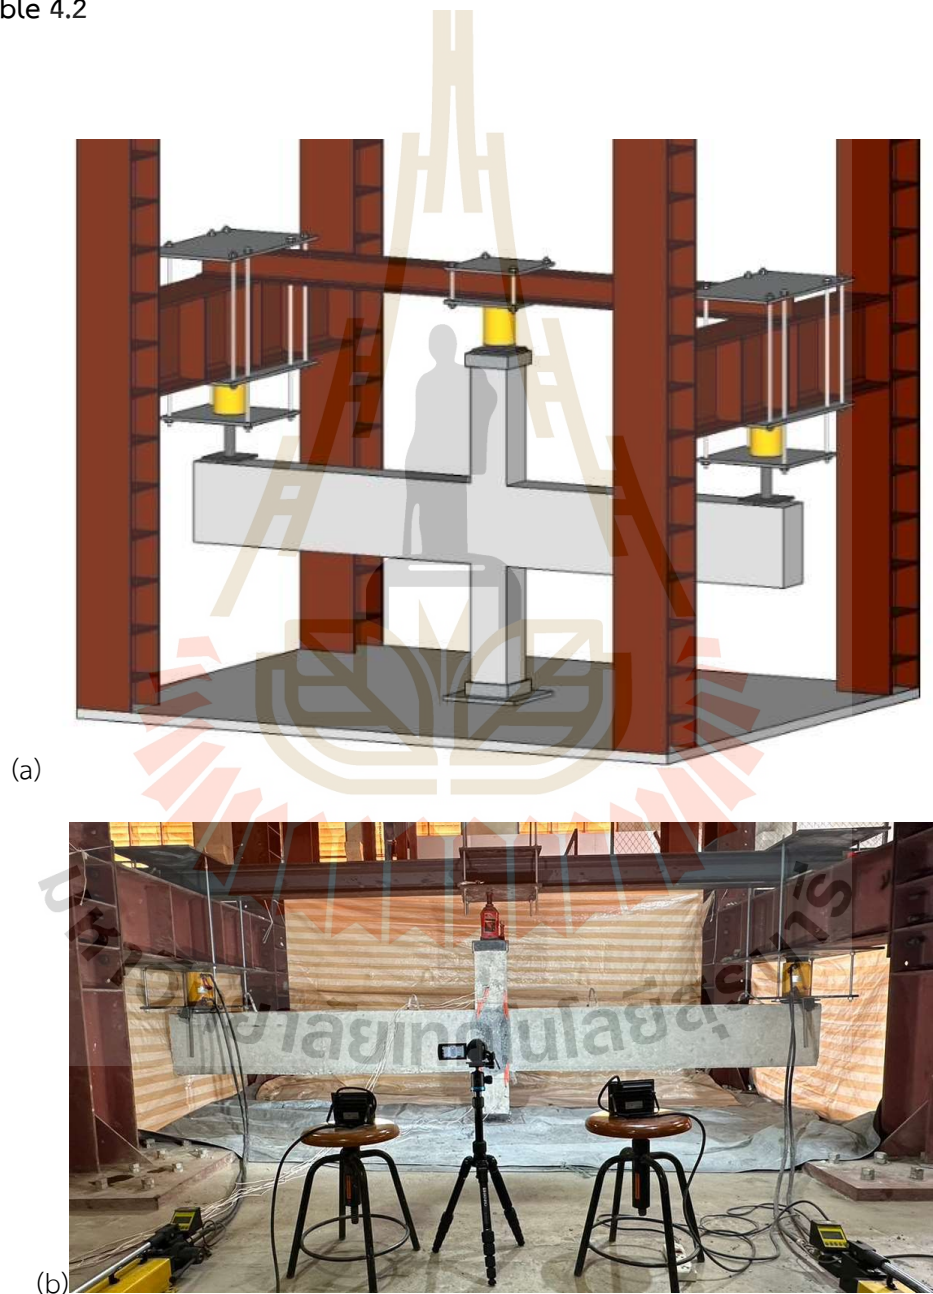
Depicts (a) the Full-Scale Test Model and (b) the Actual Test Conditions.
